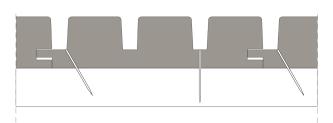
Fastening GRĖTĖ cladding boards using headless nails
